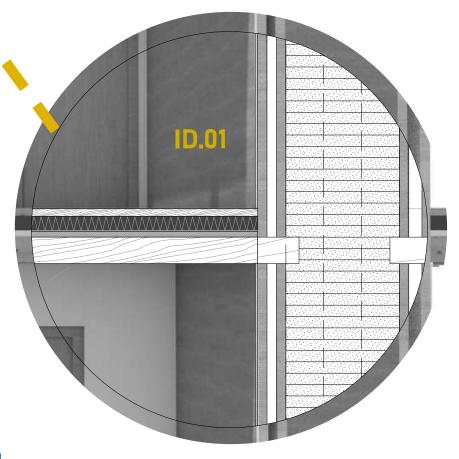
Building Structure Roof and cealing, 1:20
